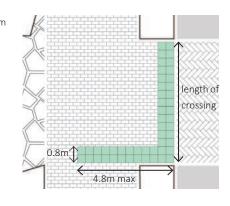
Typical application of blister paving to pedestrian raised table crossing
